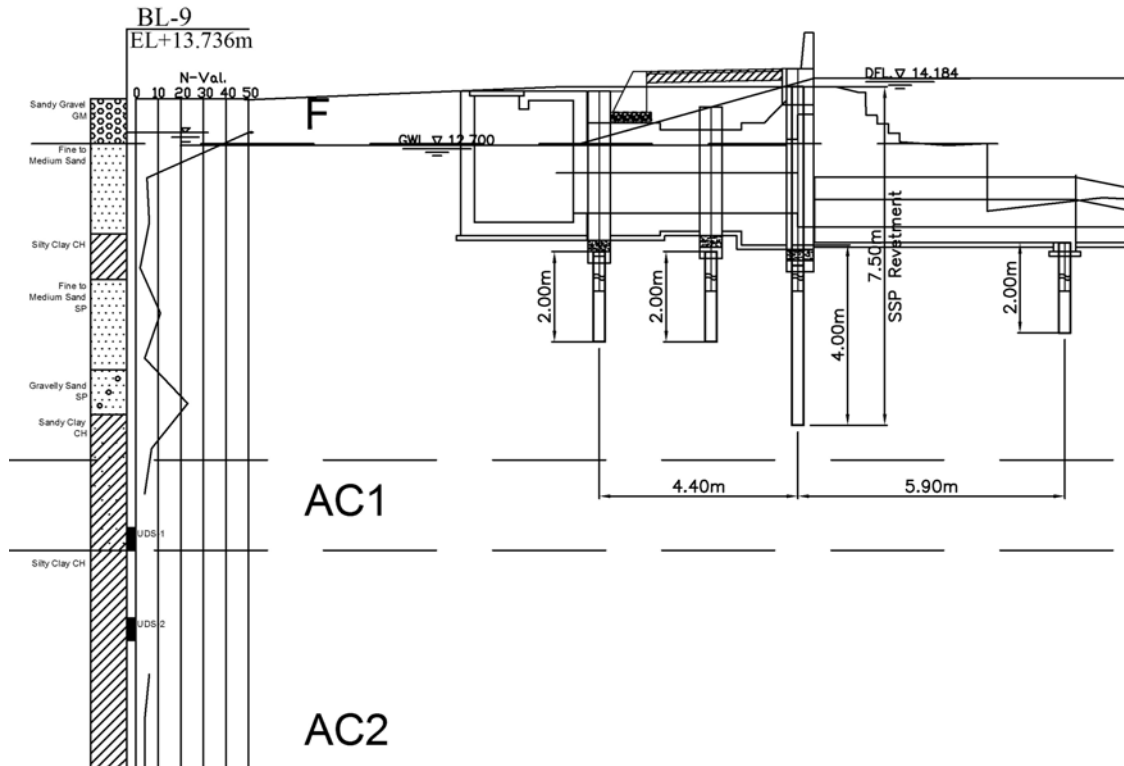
Length of SSP Cut off Wall (2/9) (MSL-2)
